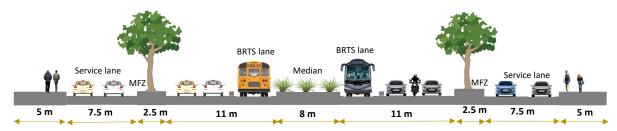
Cross Section of 30m wide Sub-Arterial Road
